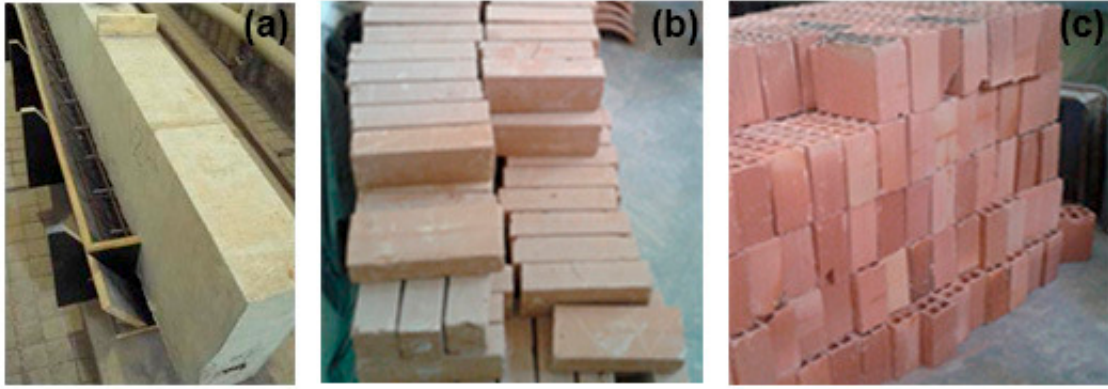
Construction components used to produce the mineral additions. Laboratory concrete beam (a), face brick (b), and hollow brick (c).
